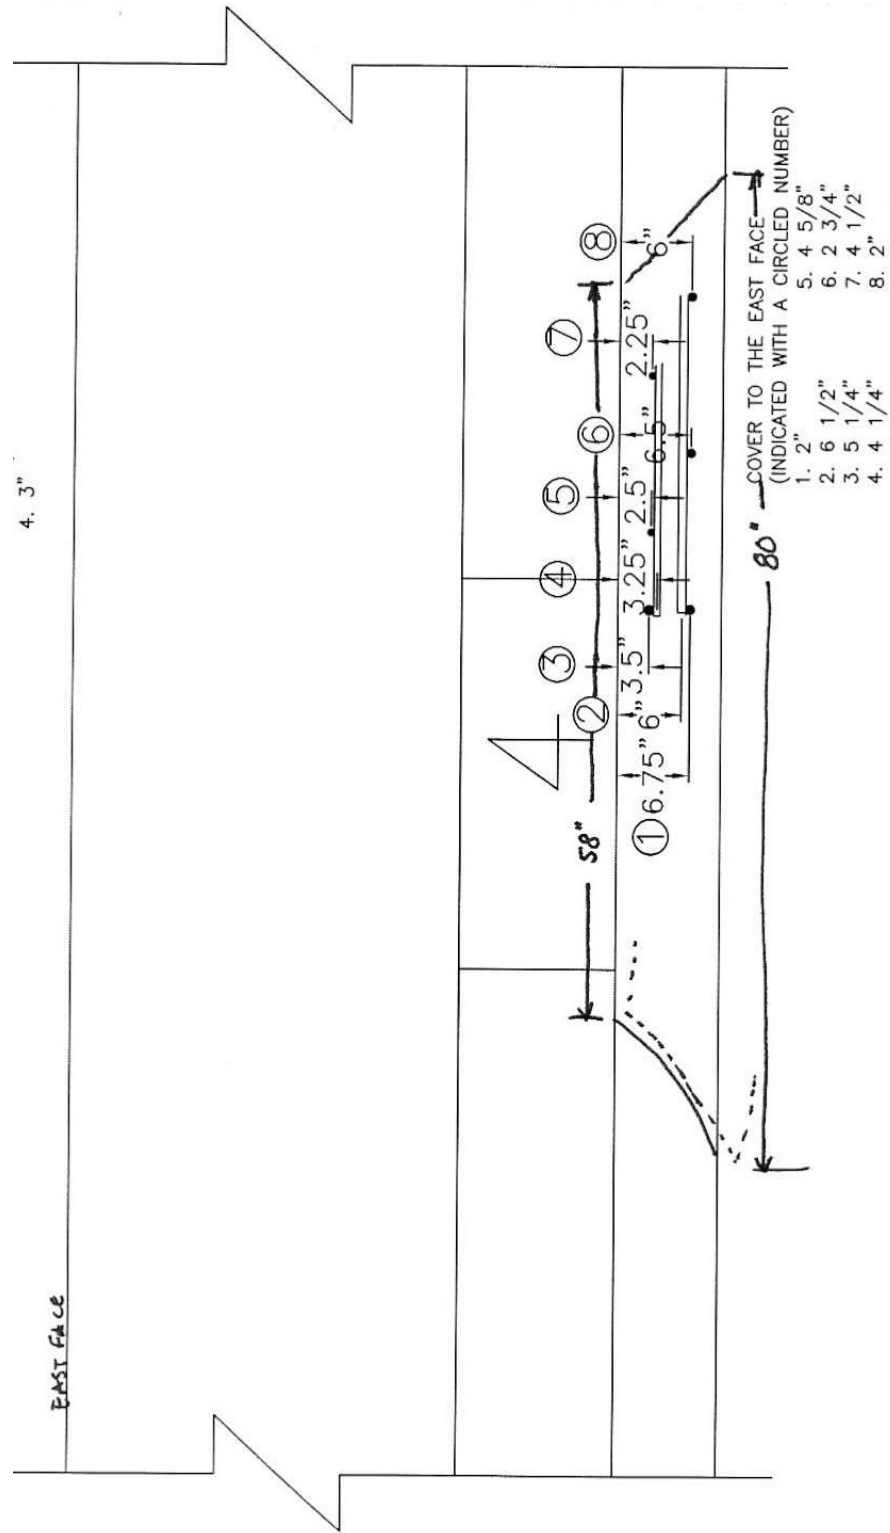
Concrete Damage – Back-side of Rail at Post No. 4, Test ACBR-1
